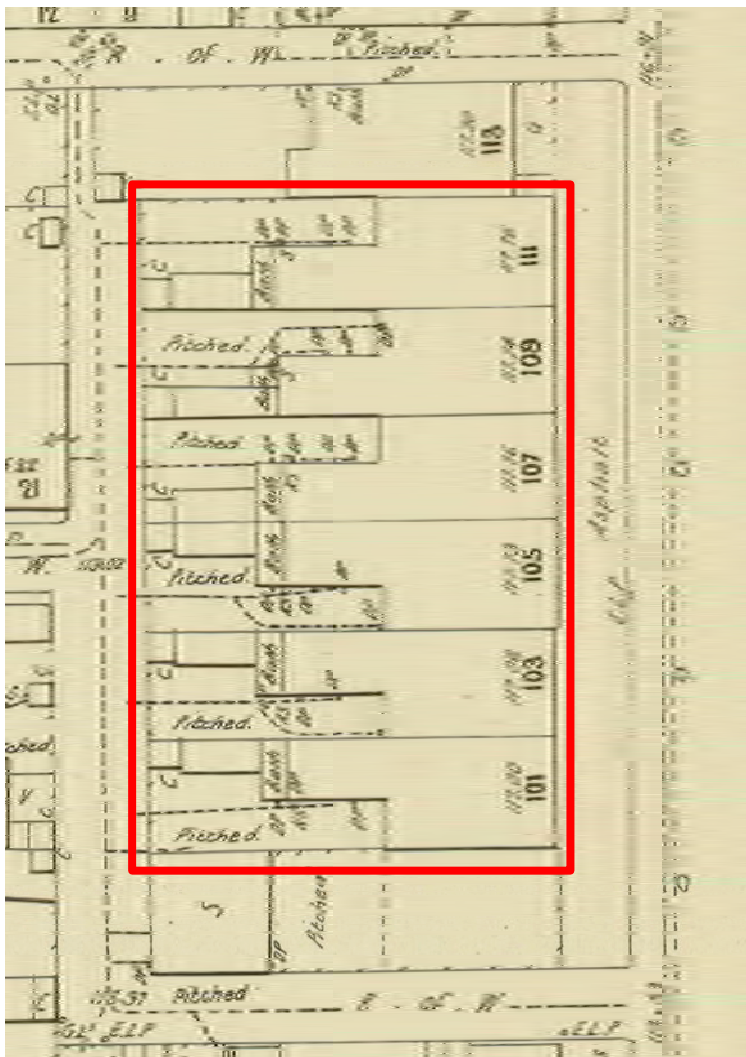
MMBW detail plan no. 1178, 1896, with subject site indicated
